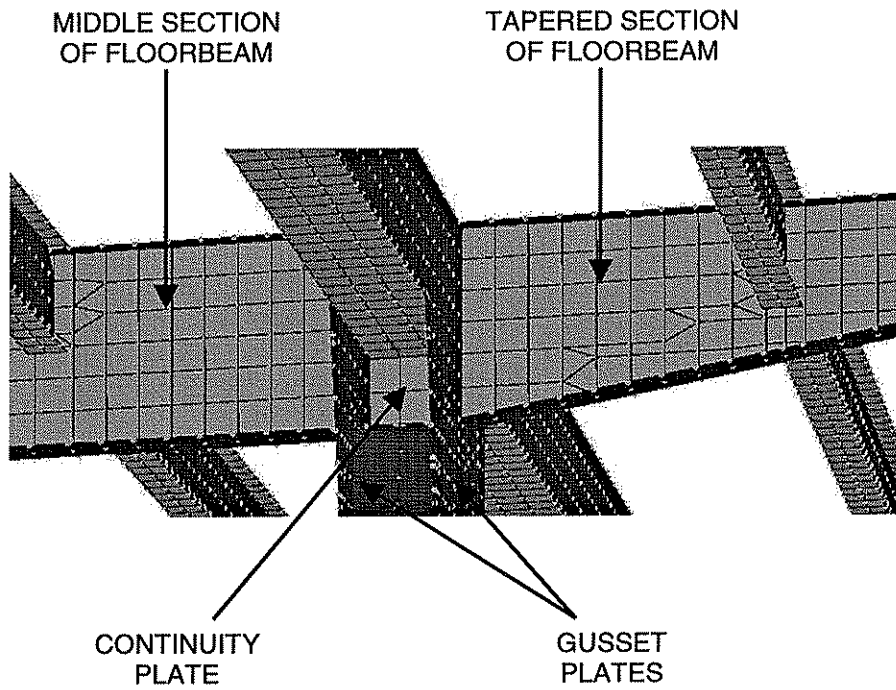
Floorbeam connection through the upper chord box sections and the gusset plates in the lateral load distribution model.
